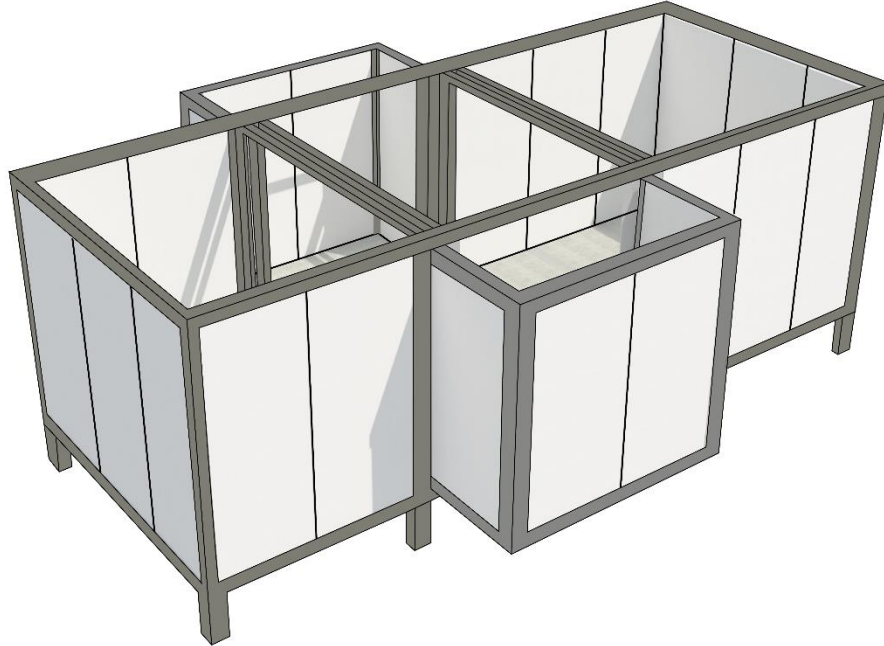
Diagram of Modular 4x10 Foot Wall Panel System
